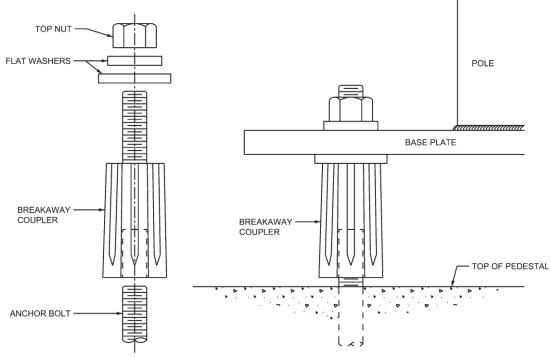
Typical Cast Aluminum Coupler Assembly
